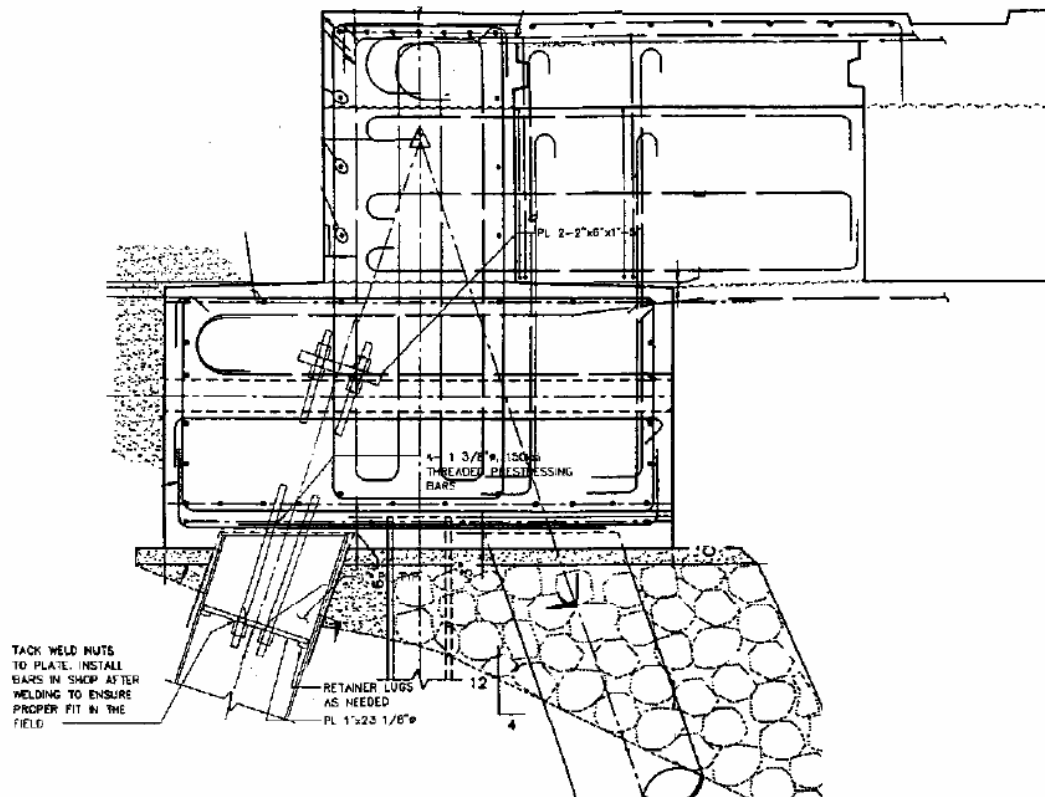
Alternative steel pile connections of a pipe-section pile (Roder, 2002)
